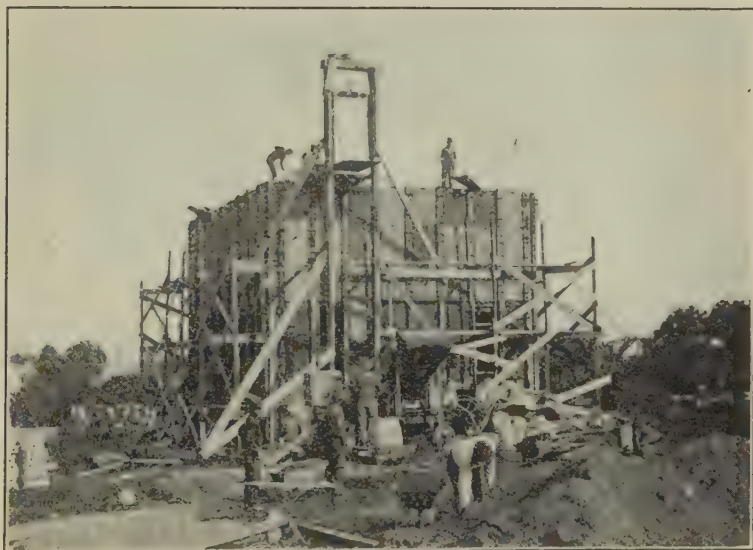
POURING ONE OF THE CONCRETE HOUSES.
